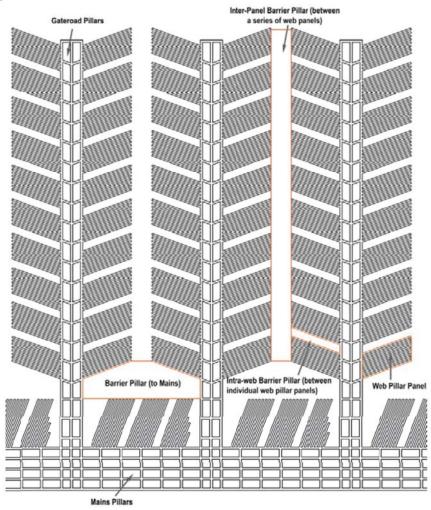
Illustration of the proposed layout showing the different coal pillar types (after Mine Advice, 2017)
